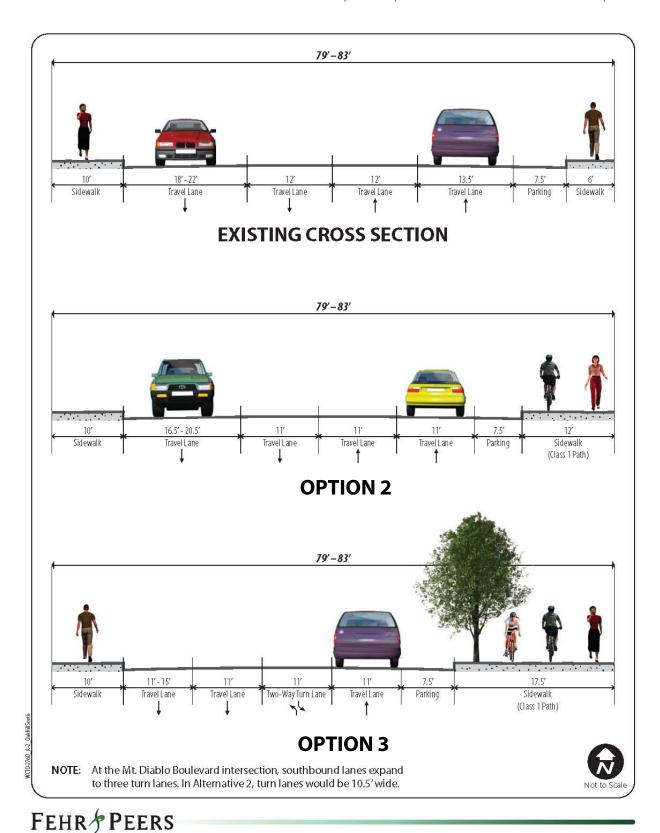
Oak Hill Road South of SR 24: Existing and Proposed Cross Sections
